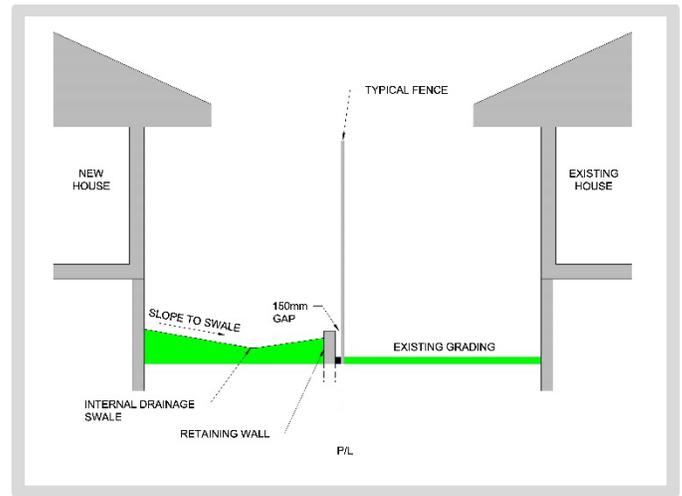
Side Yard Swale and Low Retaining Wall. Source: The City of Calgary
